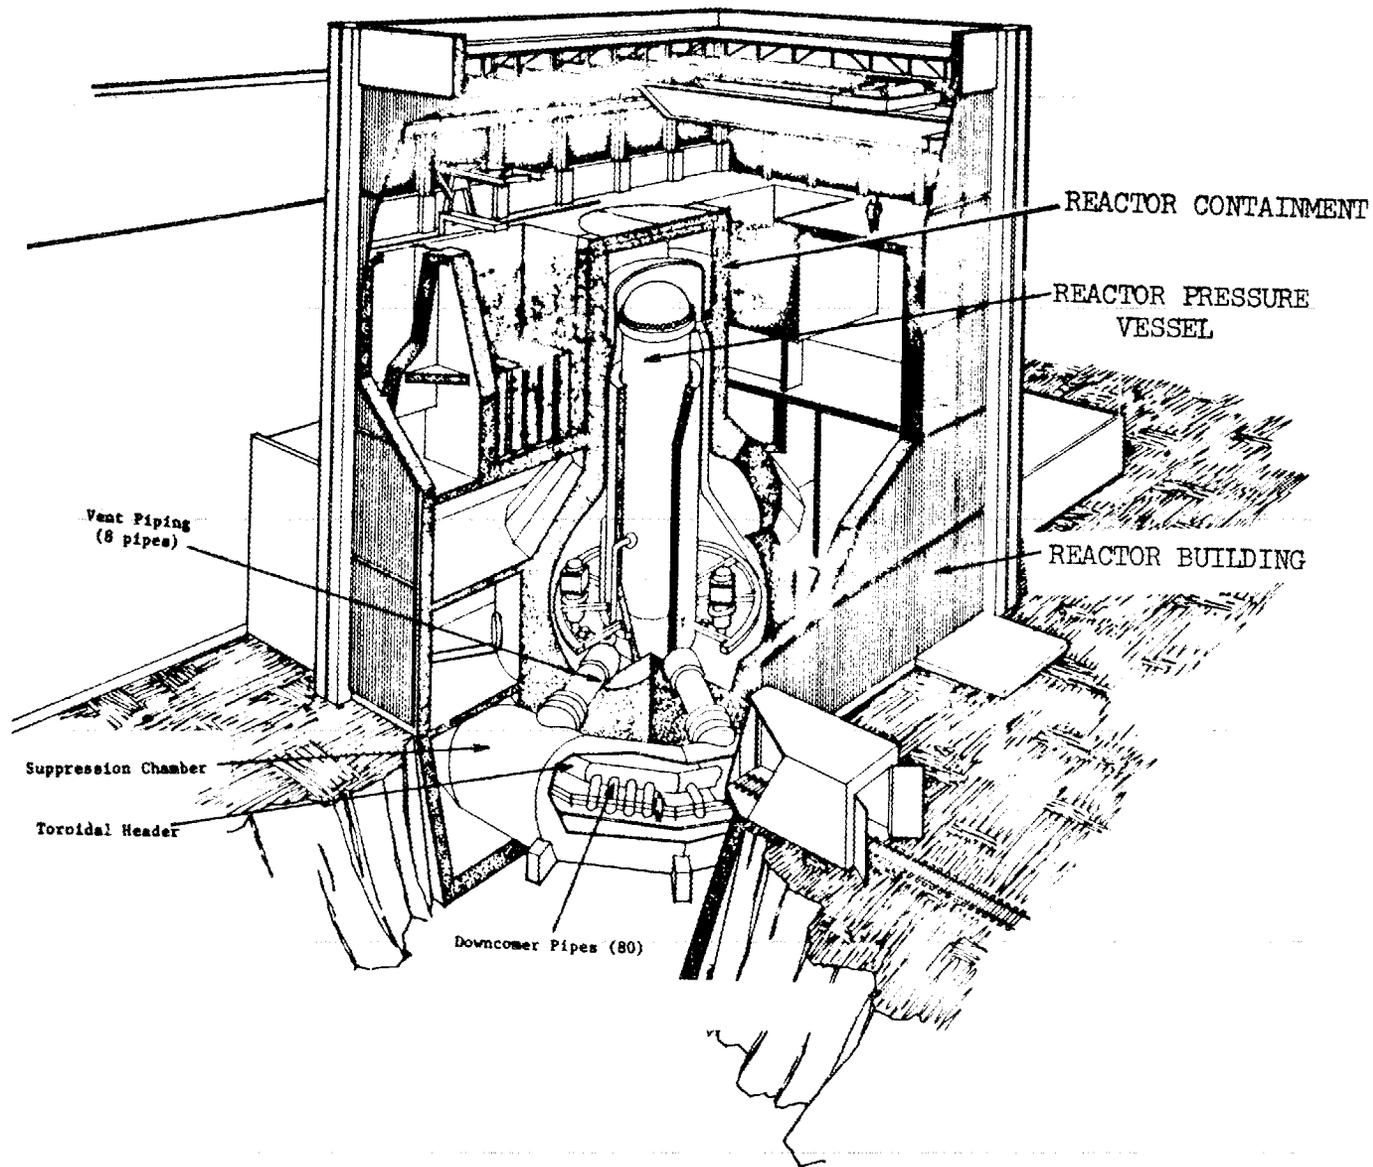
Cutaway View of a BWR Secondary Containment Building Showing Primary Containment System Enclosed
